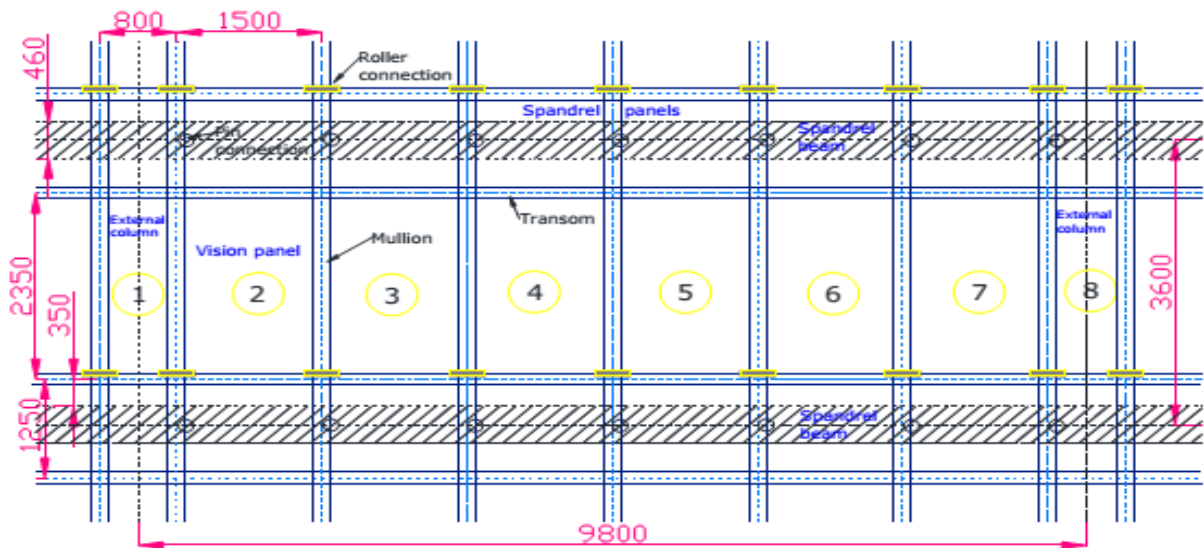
Typical layout of unitized framed glass façade system for façade grid
